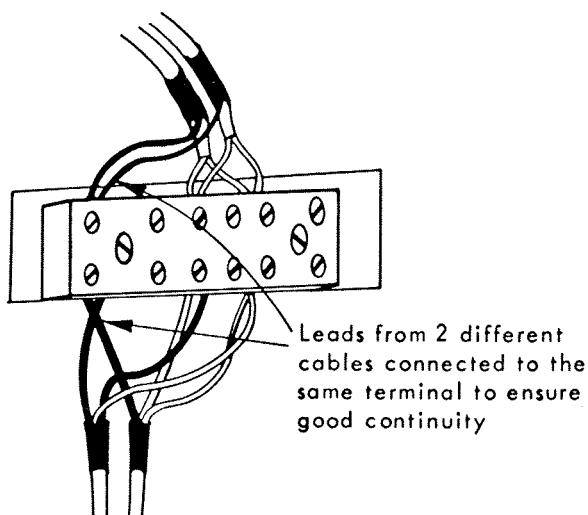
REMOTE CONTROL CABLE - CABINET TERMINAL BOX SIDE
